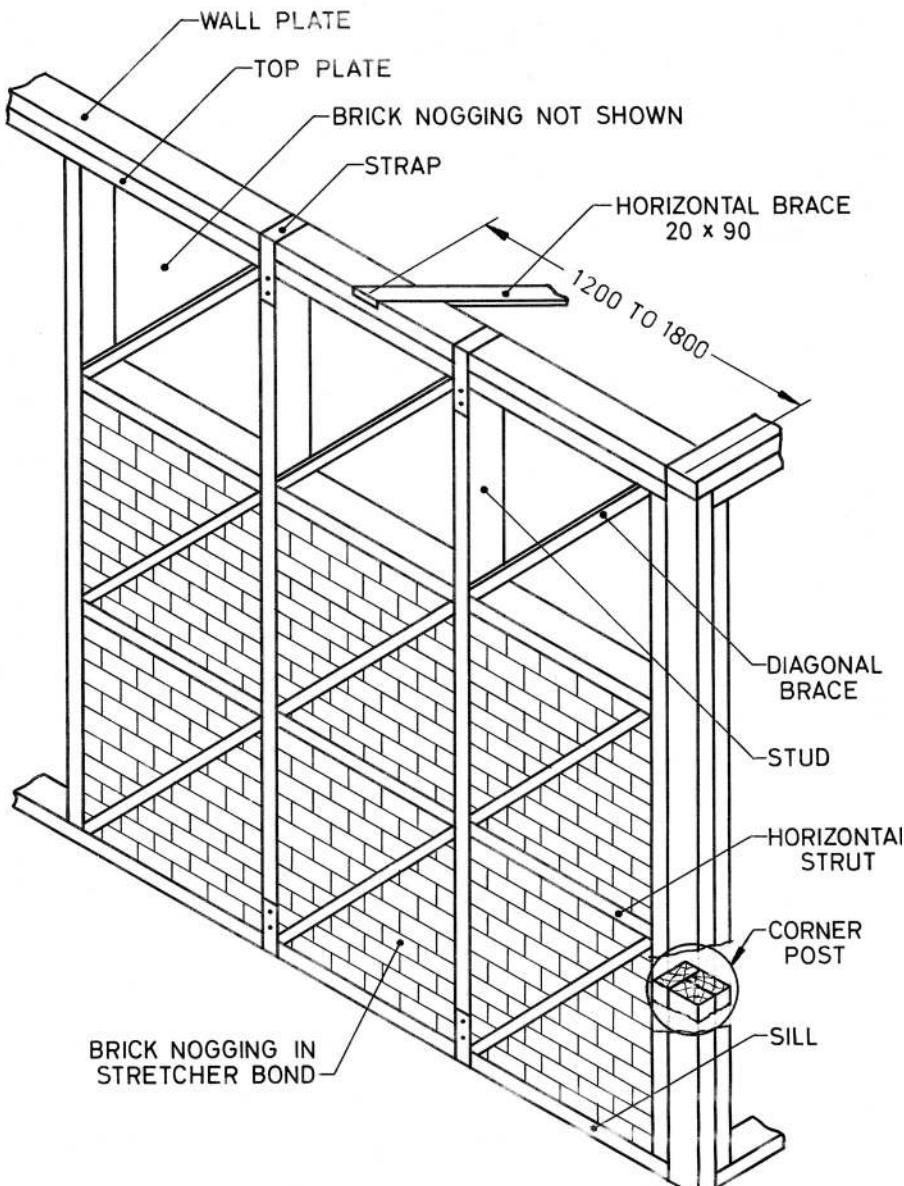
STUD WALL CONSTRUCTION (*Continued*)
